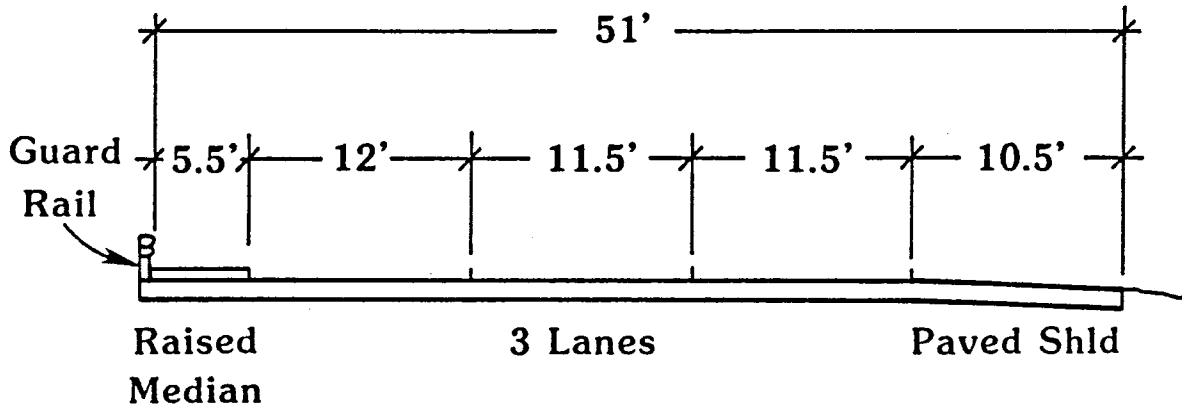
SH 183 Selected Segment Cross-Sections, Dallas
